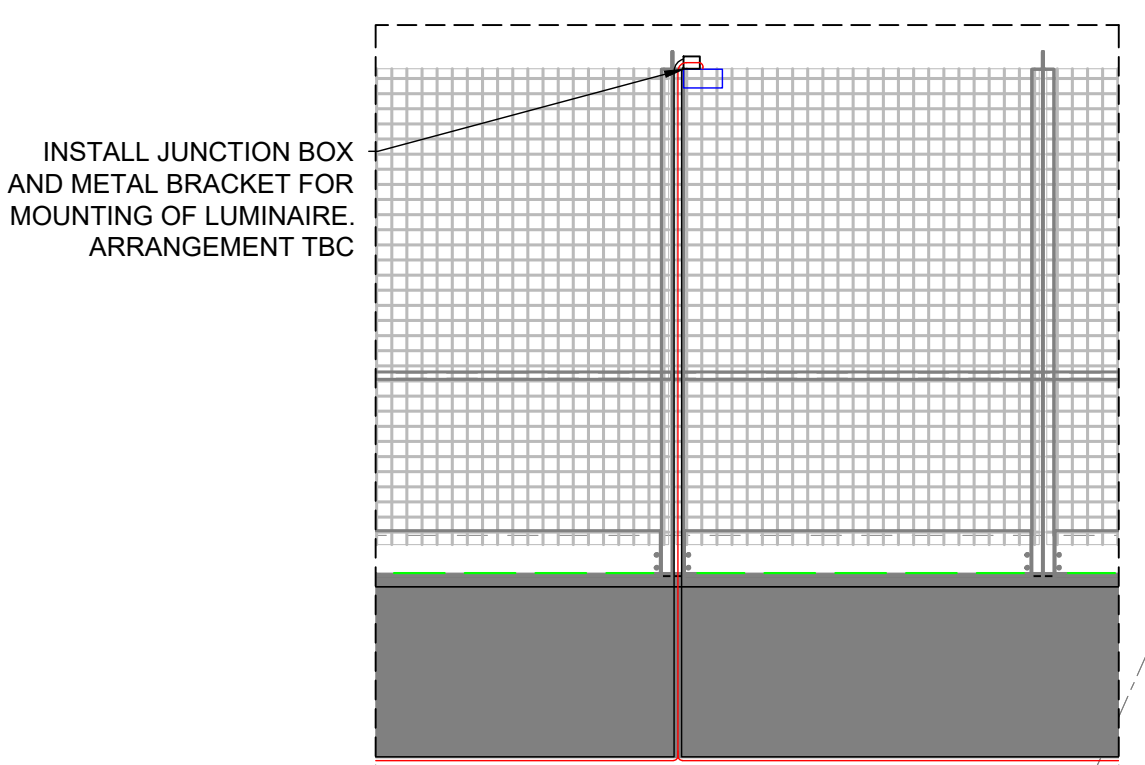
B: CONDUIT UNDER RAMP TYPICAL ARRANGEMENT
